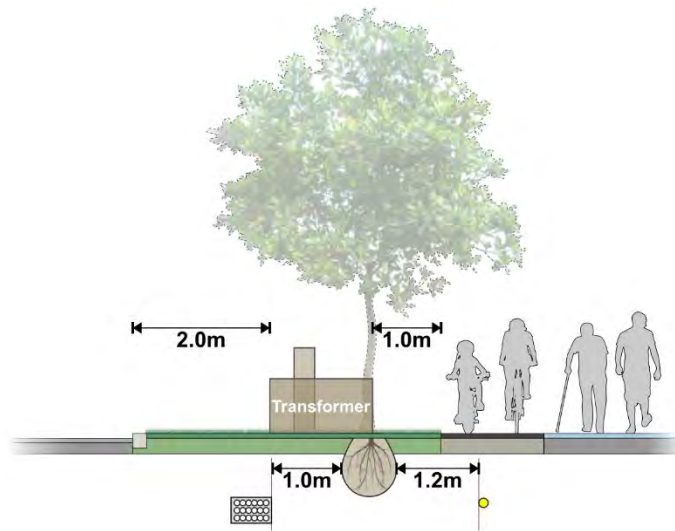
Surface-mount hydroelectric transformers need separation from roadways, parking, cycle-tracks and sidewalks, and tree root balls must have separation when planted (minimum of 1.0m from duct banks and 1.2m from gas main)
